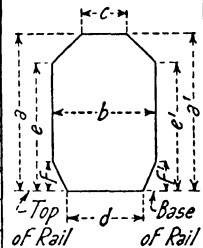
SINGLE TRACK THROUGH PIN-CONNECTED RAILWAY BRIDGE.
